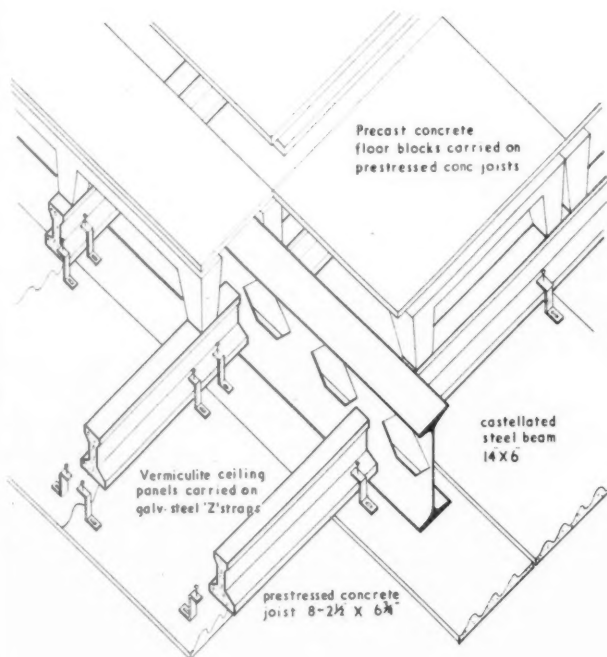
Detail of shaded section in Fig. 2. The prestressed joists are bedded dry on the steelwork flanges, but the "legs" of the concrete units are bedded on the tops of the joists in cement fondu. Small pre-cast concrete spacers which rest on the flanges of the pre-stressed joists are used to maintain position of the joists, but these were found to be necessary for initial location only.
